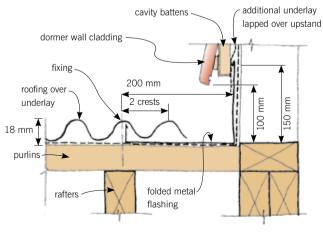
Detail B in Figure 1 – dormer flashing under roofing.
